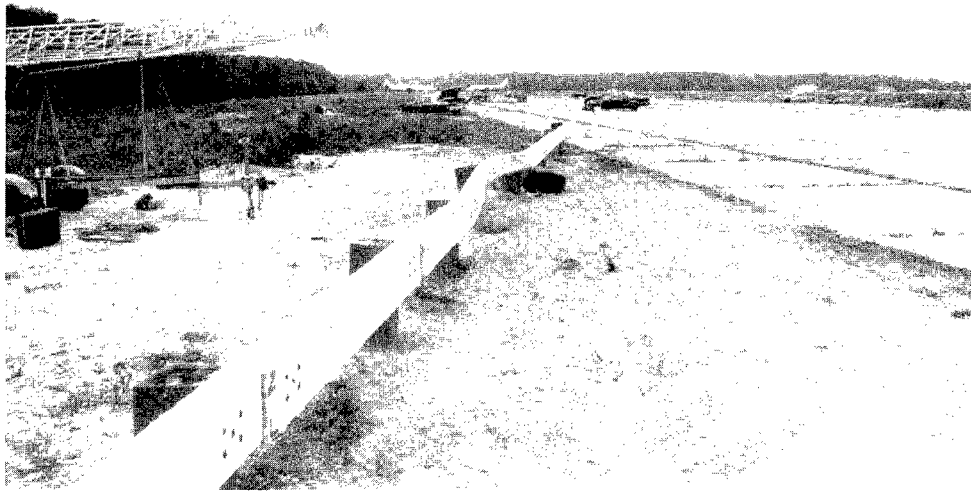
Posttest photographs of guardrail system, test 1818-14-88.
